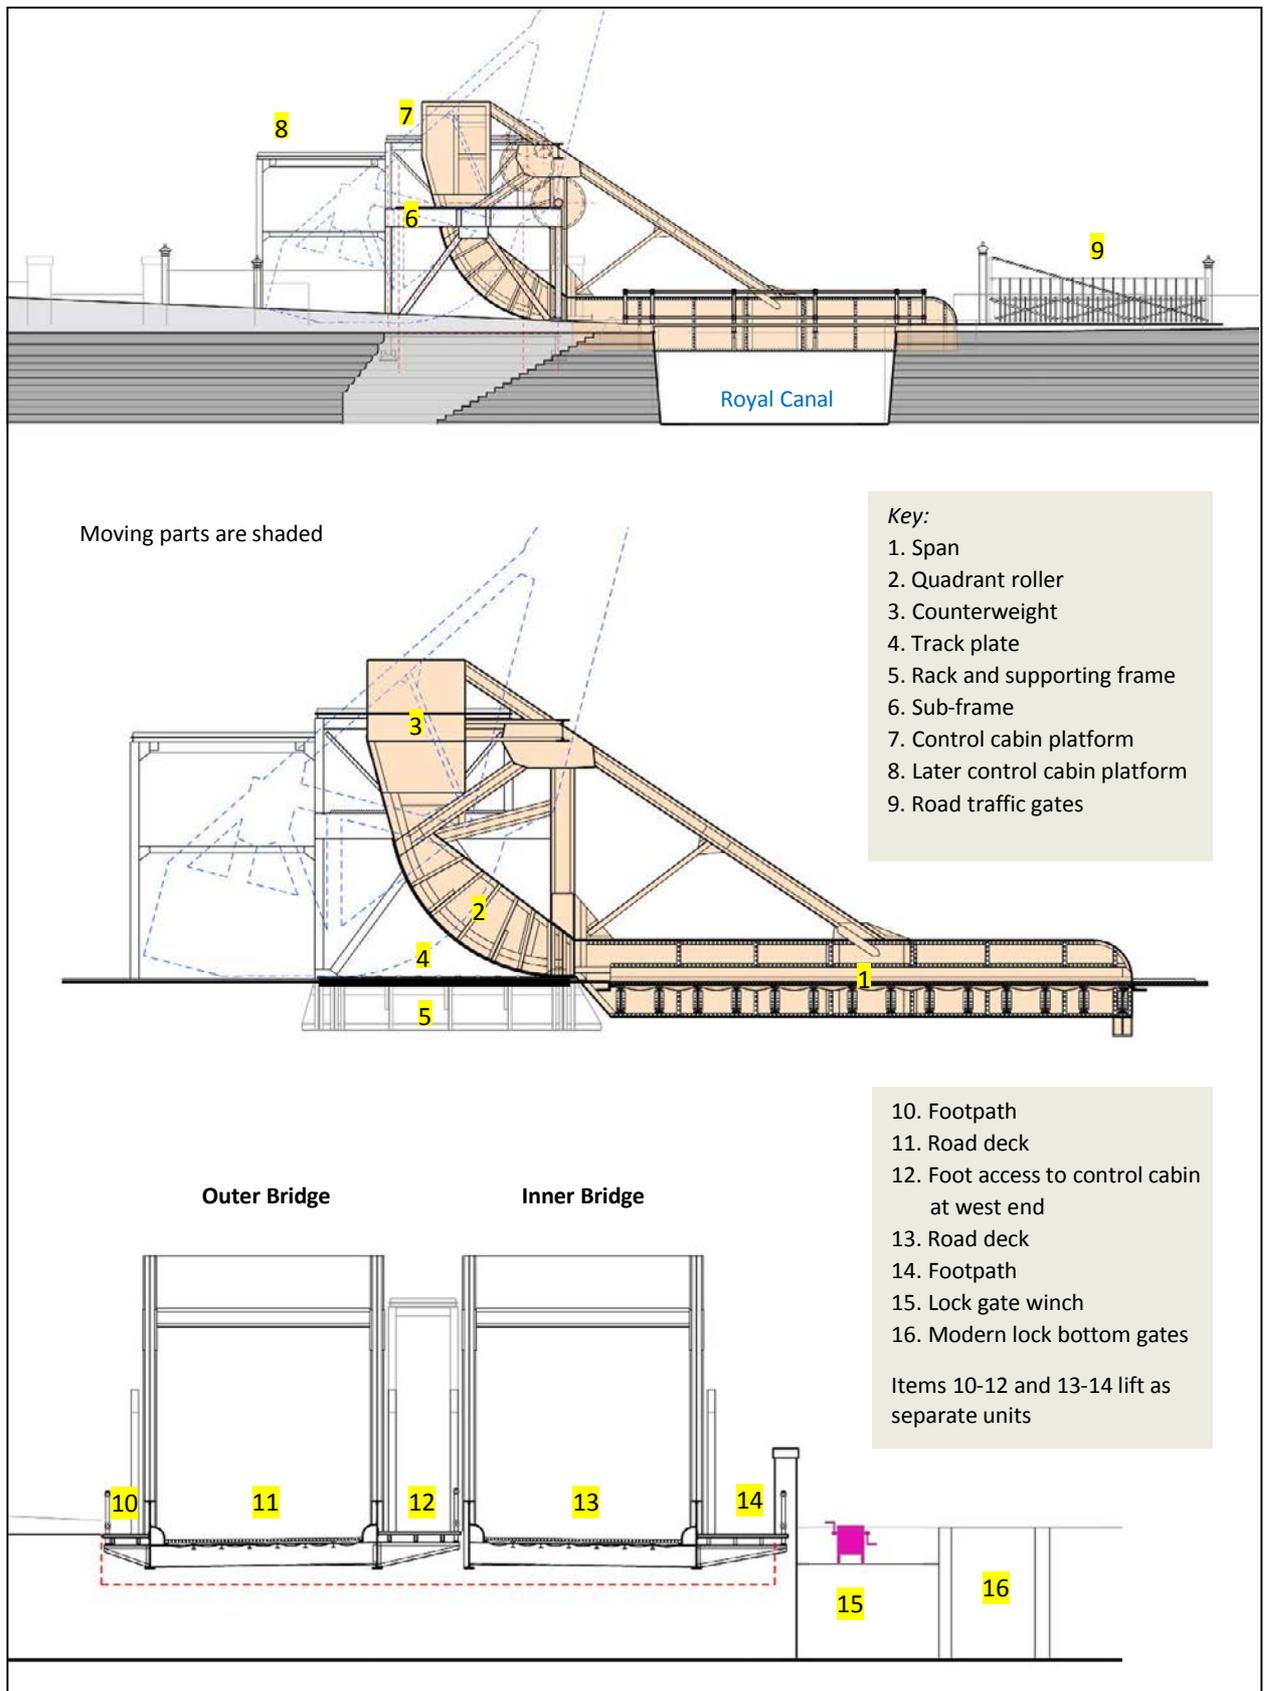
Top*: Elevation of Outer Bridge, from south. *Middle*: Longitudinal section. *Bottom*: Cross-section, from east.
